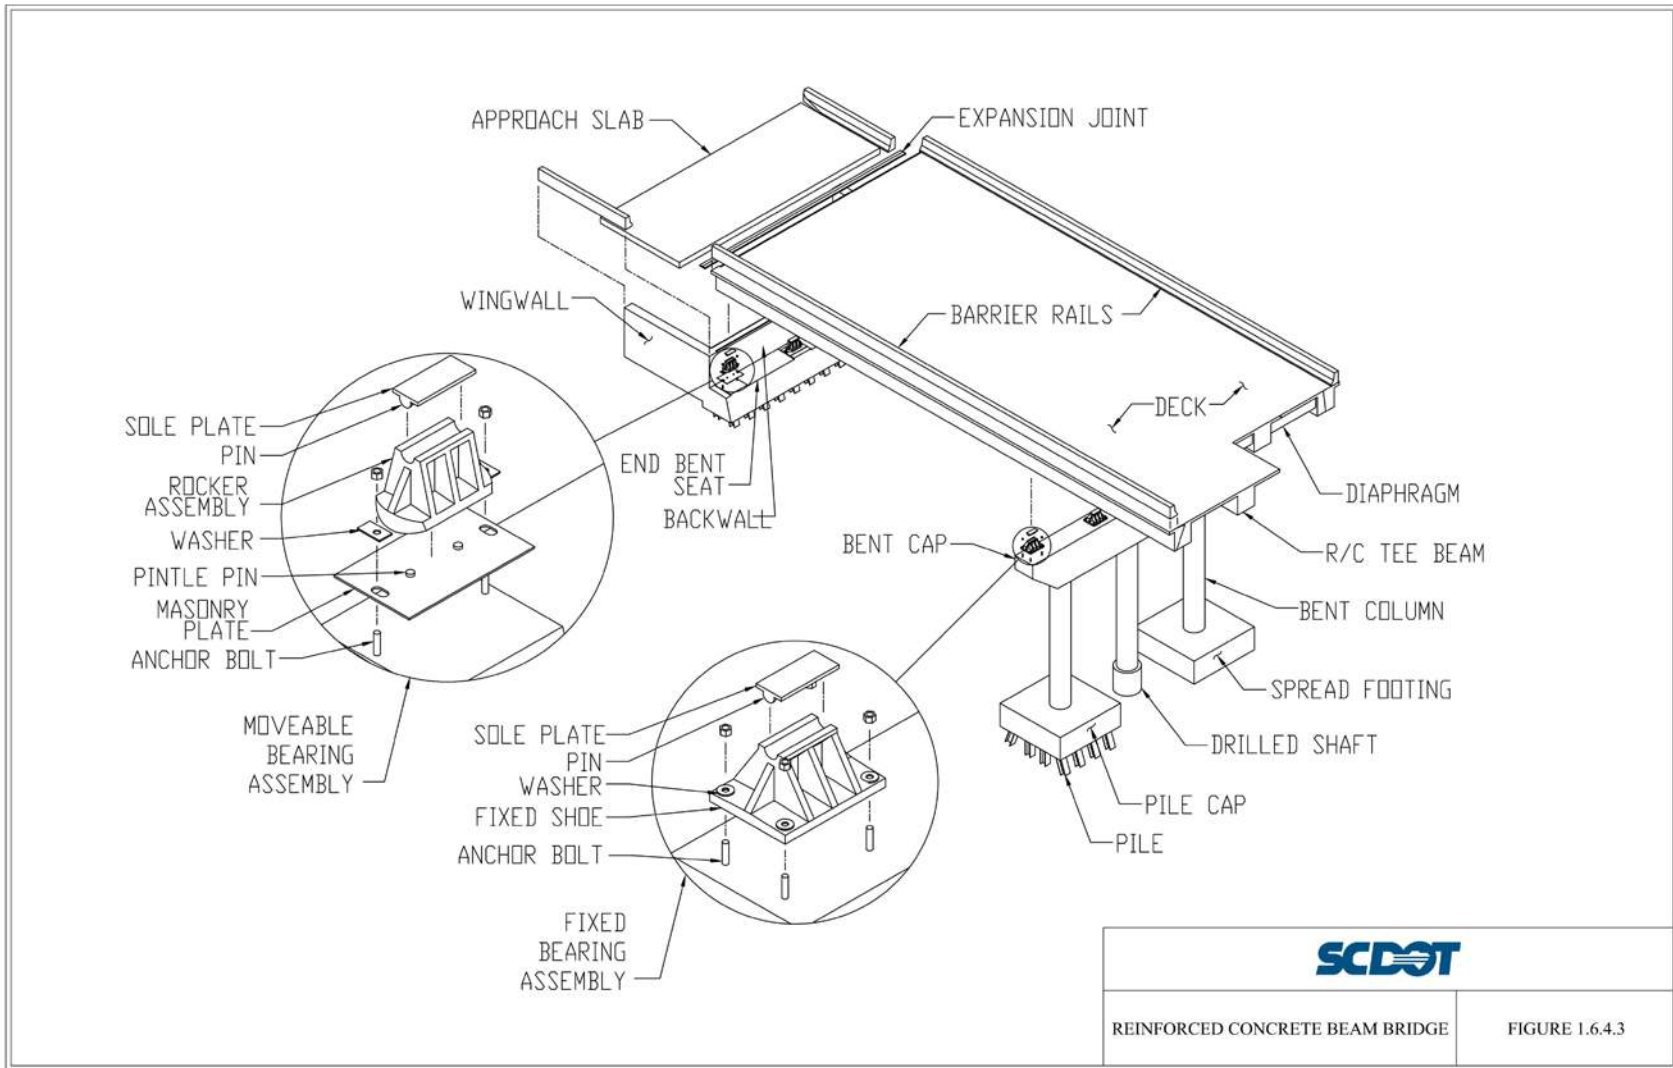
Reinforced Concrete Beam Bridge Components
